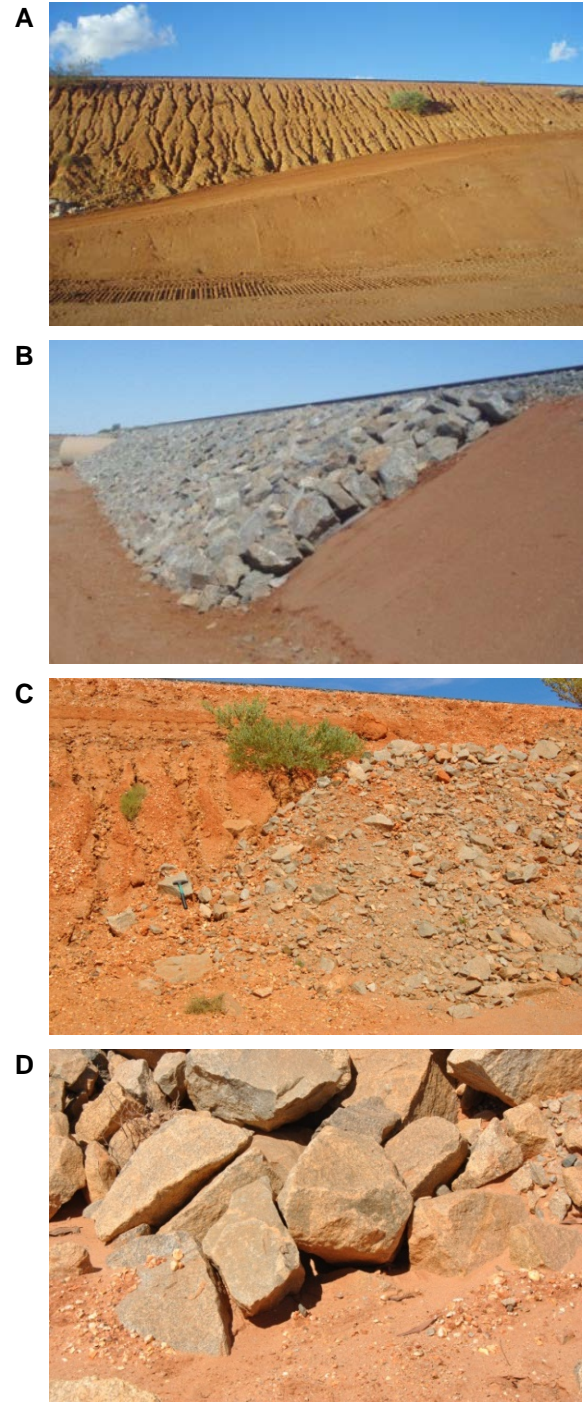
Post-construction rehabilitation of eroded embankments. A) Extending the width of the earth embankment to control embankment erosion. B) Placement of geotextile and rip-rap. C) Excess blast spoil dozed against embankment face to control embankment erosion. D) Fines appear to readily migrate through the improvised rip-rap shown in photograph C.
